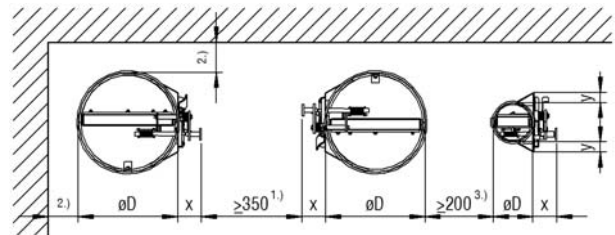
Minimum distances to walls, ceilings and BSK-RPR to one another
